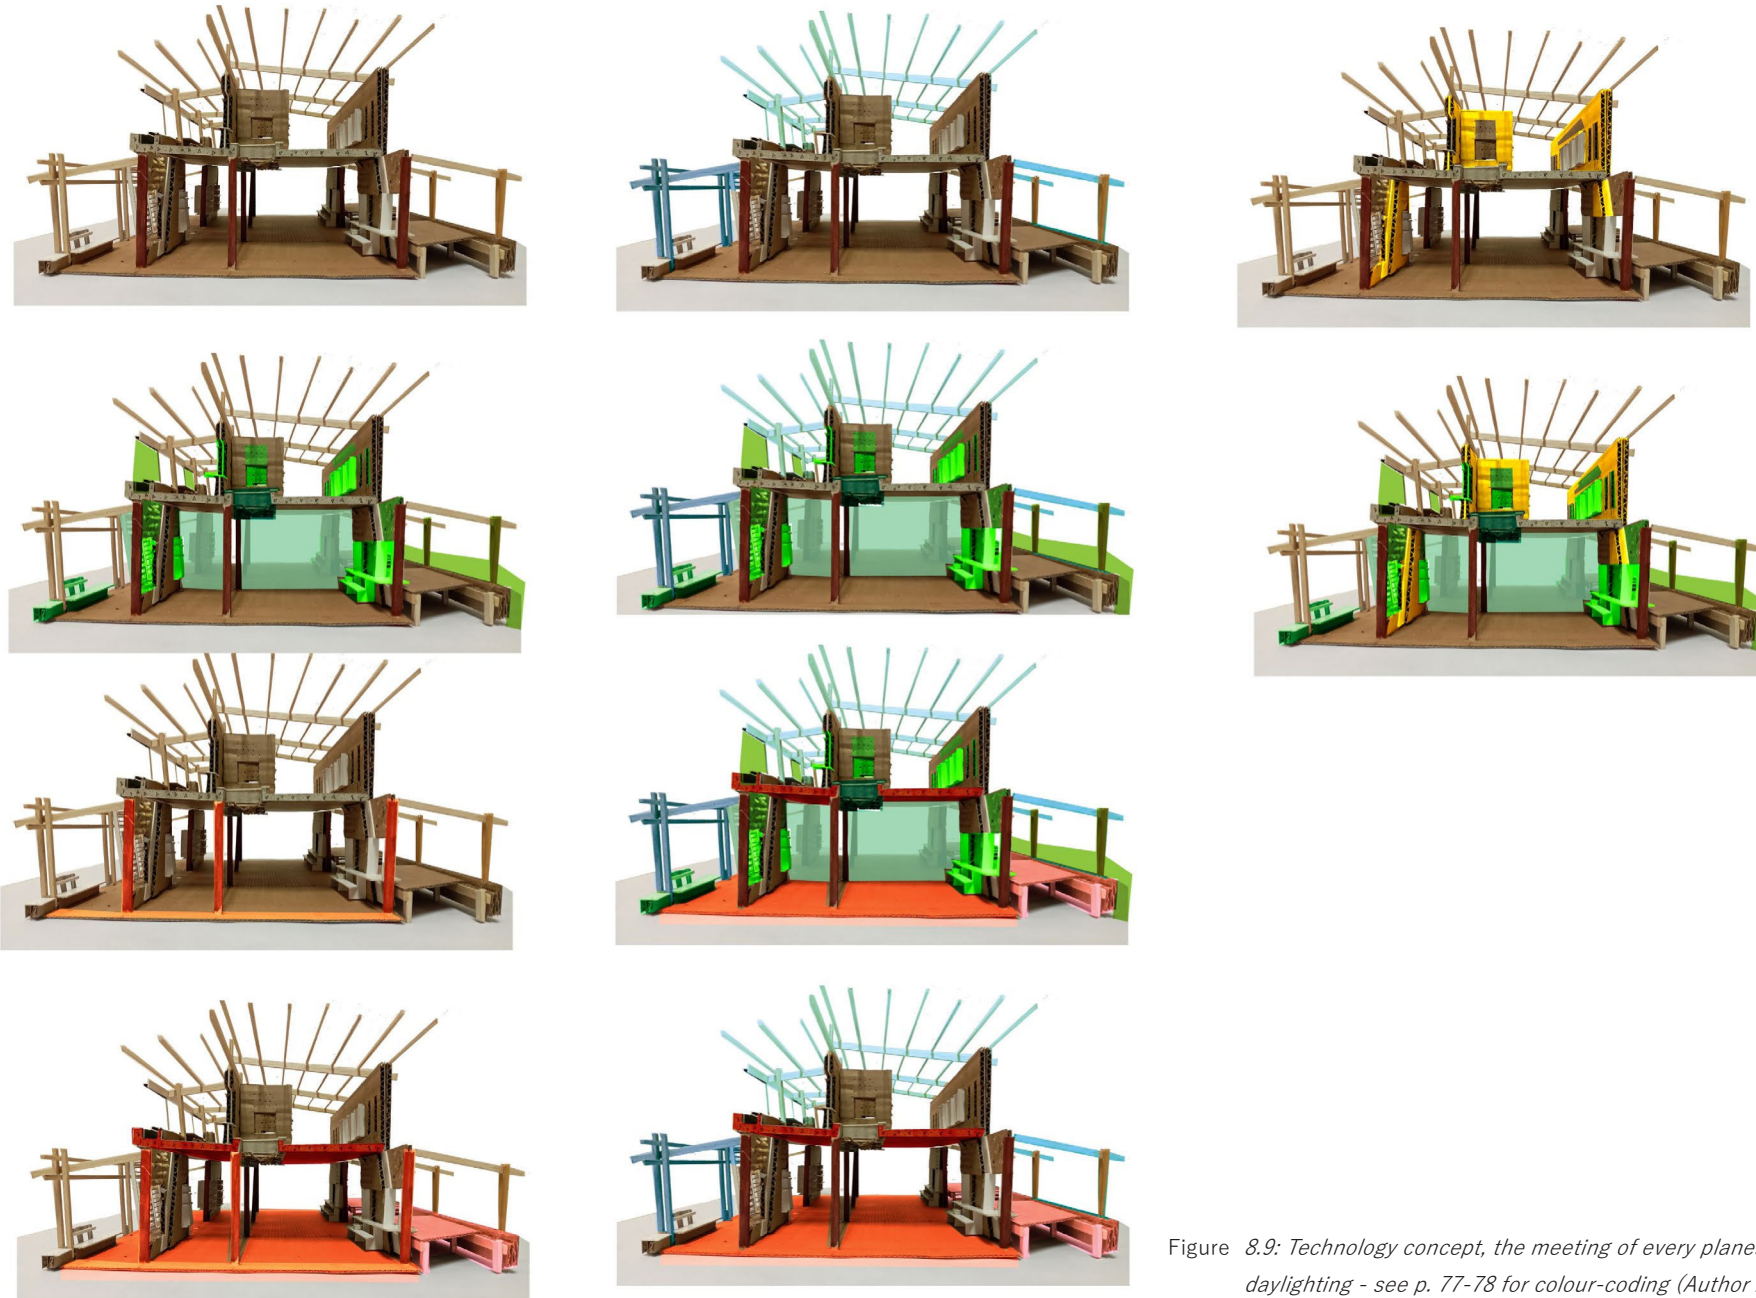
Technology concept, the meeting of every planes, ventilation and daylighting - see p. 77-78 for colour-coding (Author 2021)
